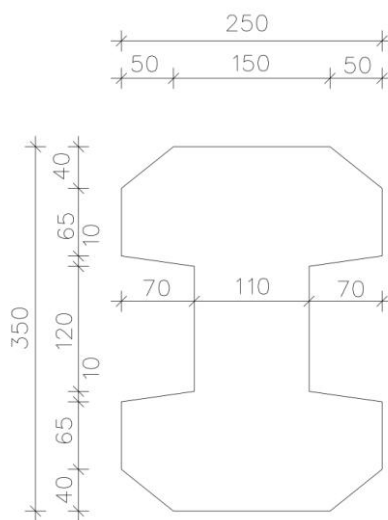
Dimensions of cross-section of pillar of noise walls
